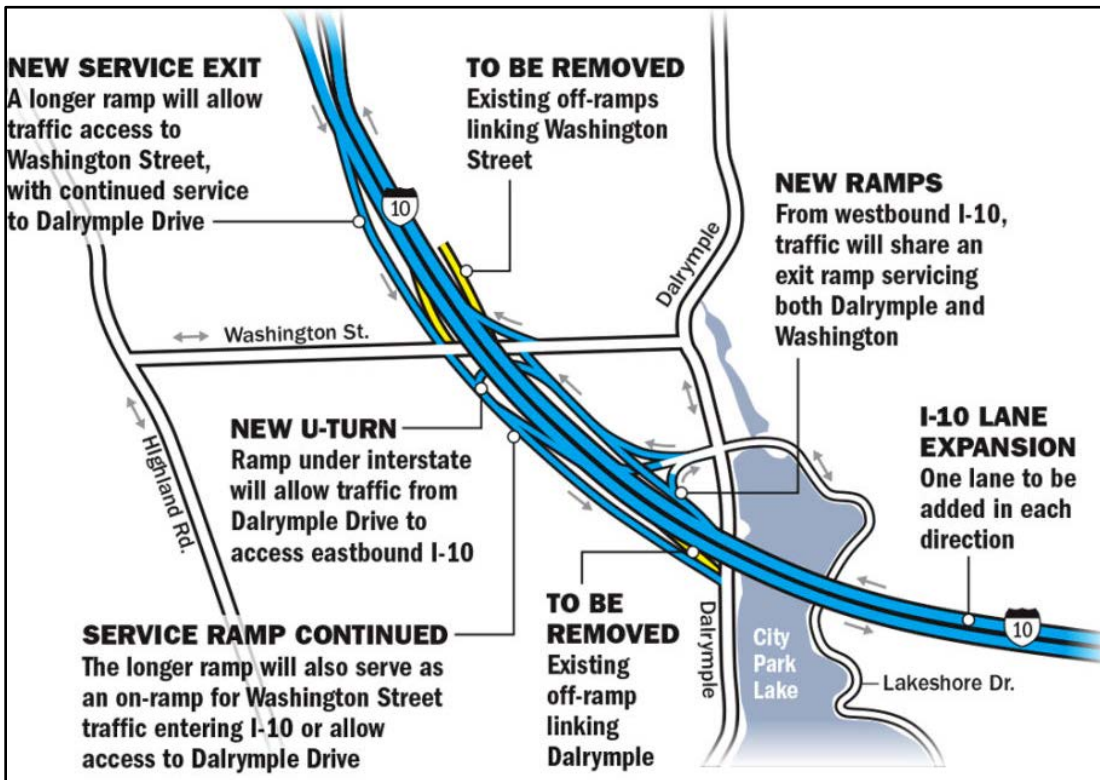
Stage-1: Redesign and construction of exits at Washington Street and Dalrymple Drive (17).
